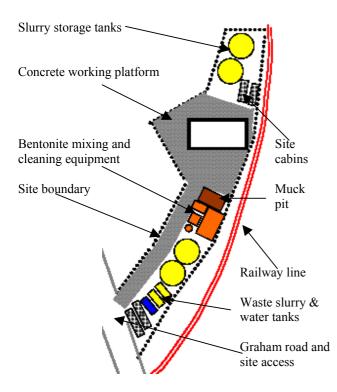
Sketch showing arrangement of static plant. The 28m x 12m shaft helps demonstrate the size of the site and the area available for the work.
